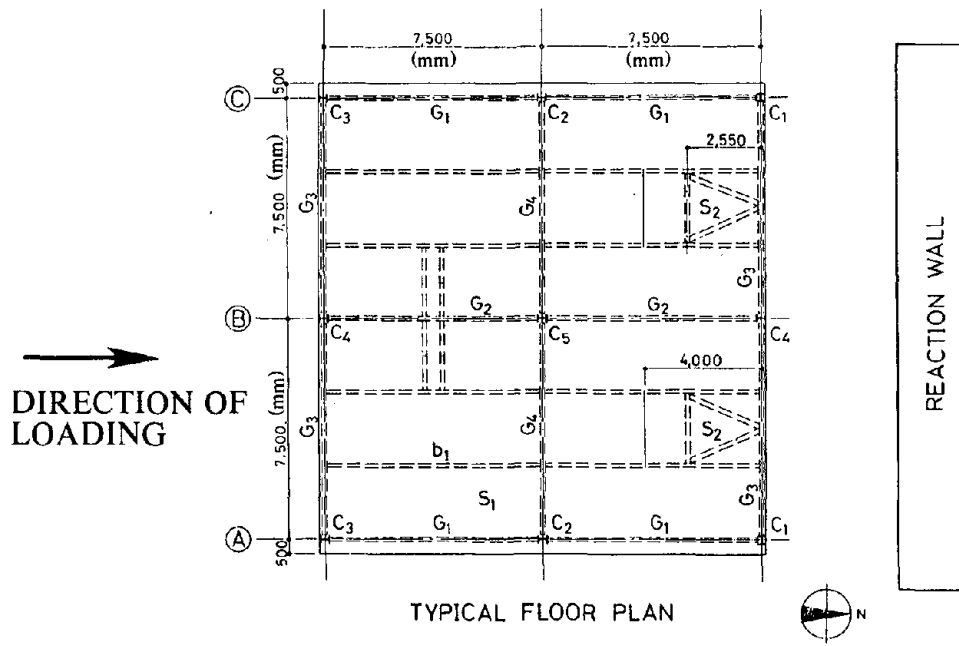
Typical Plan View of the U.S.-Japan Building [34]
